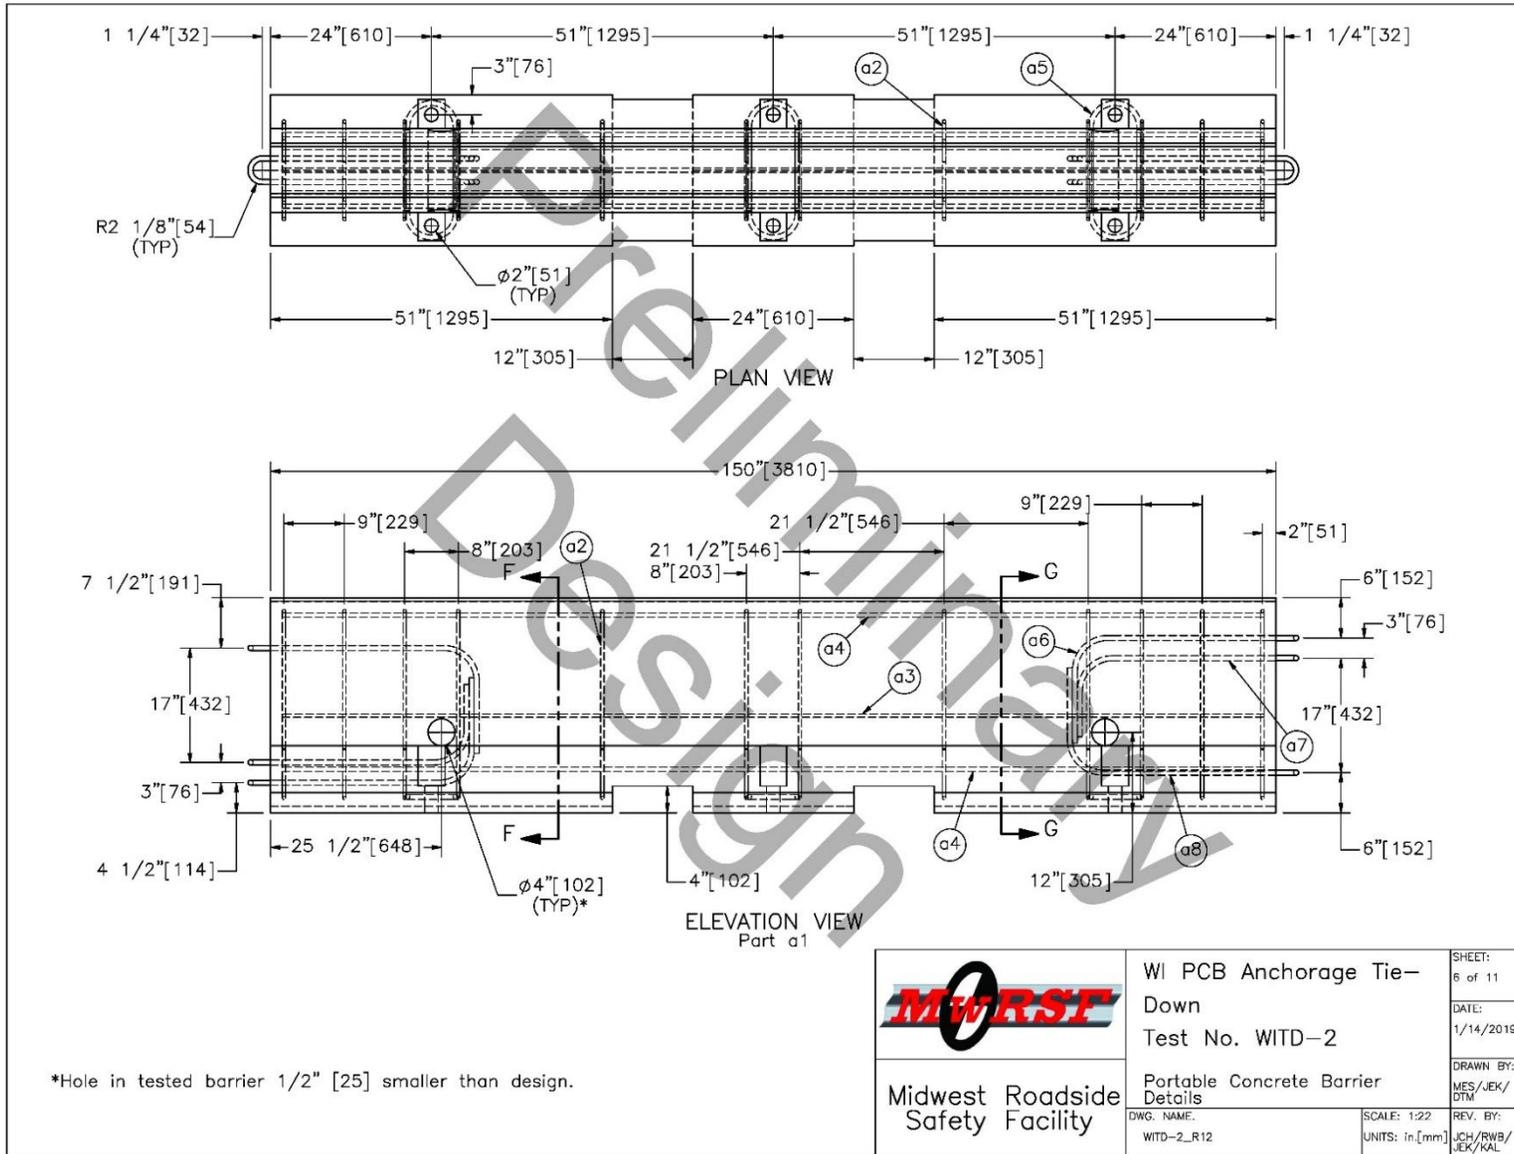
Portable Concrete Barrier Details, Test No. WITD-2
